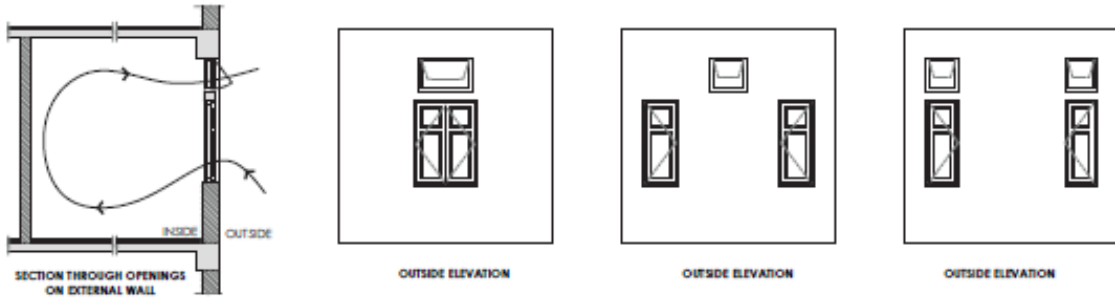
Adding ventilators above windows improves ventilation especially when only single external wall is available for openings (Guideline)
